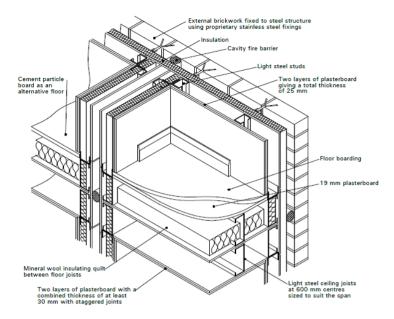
Compartment Floor at Junction (SteelConstruction.info, 2012).
